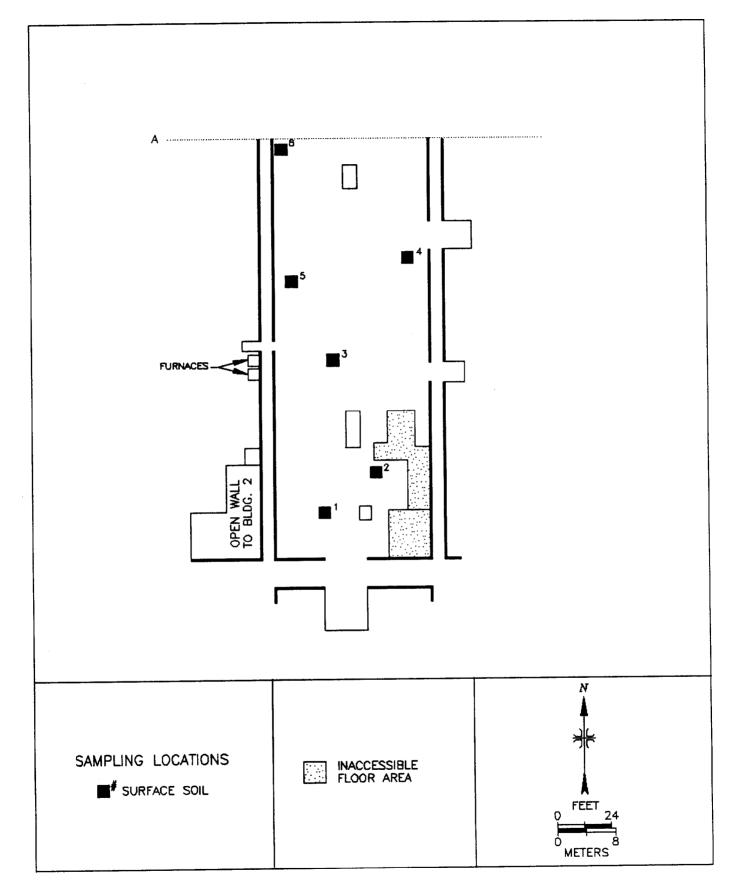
Building 1, Section A - Soil Sampling Locations
